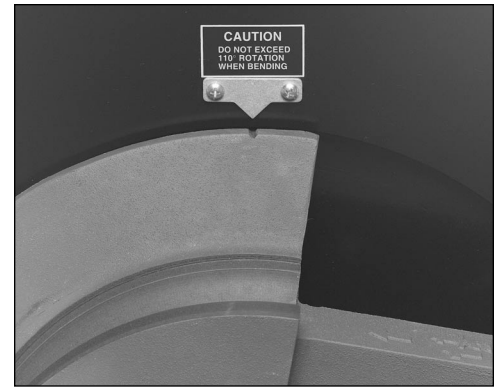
1 1/4 and 2 in. (32 and 50 mm)
